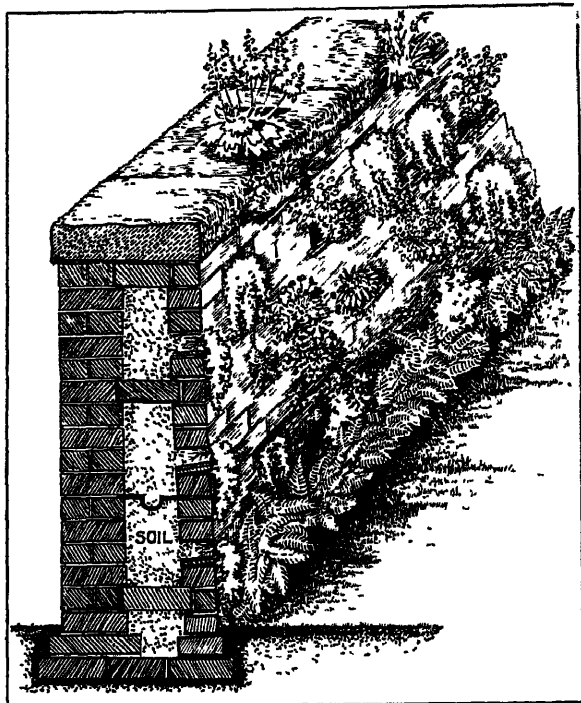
BRICK WALL BUILT SPECIALLY FOR WALL PLANTS.
